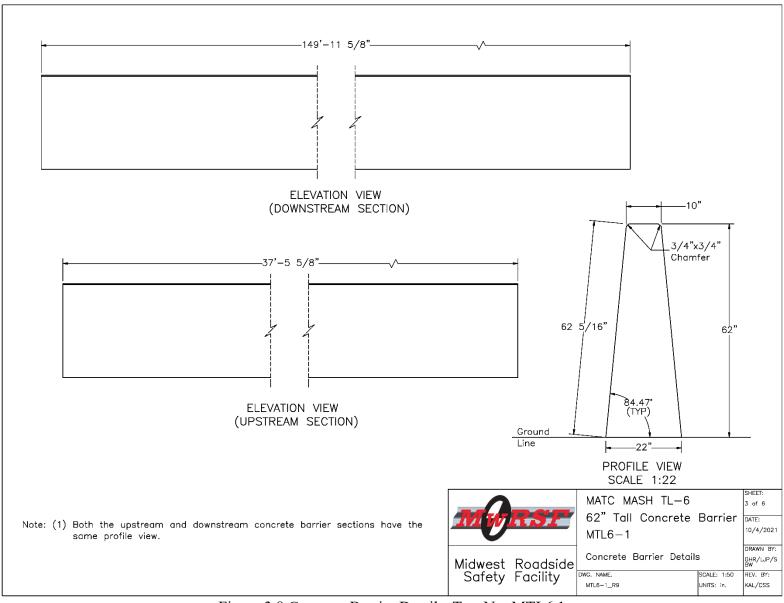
Concrete Barrier Details, Test No. MTL6 1
